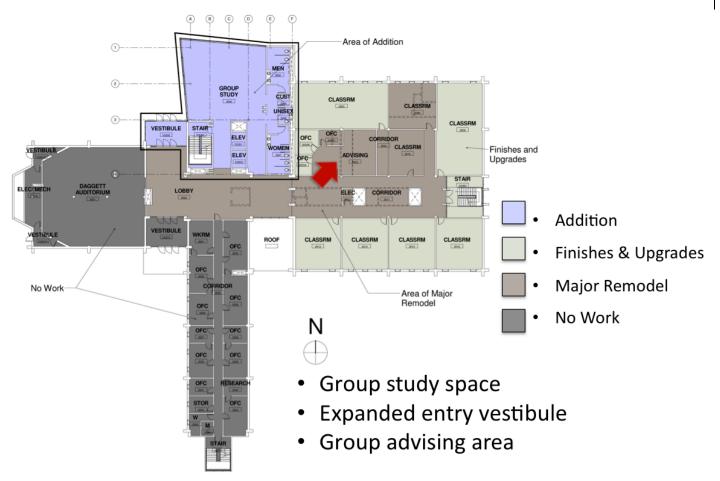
Level 1 Floor Plan, Features, & Rendering Location
